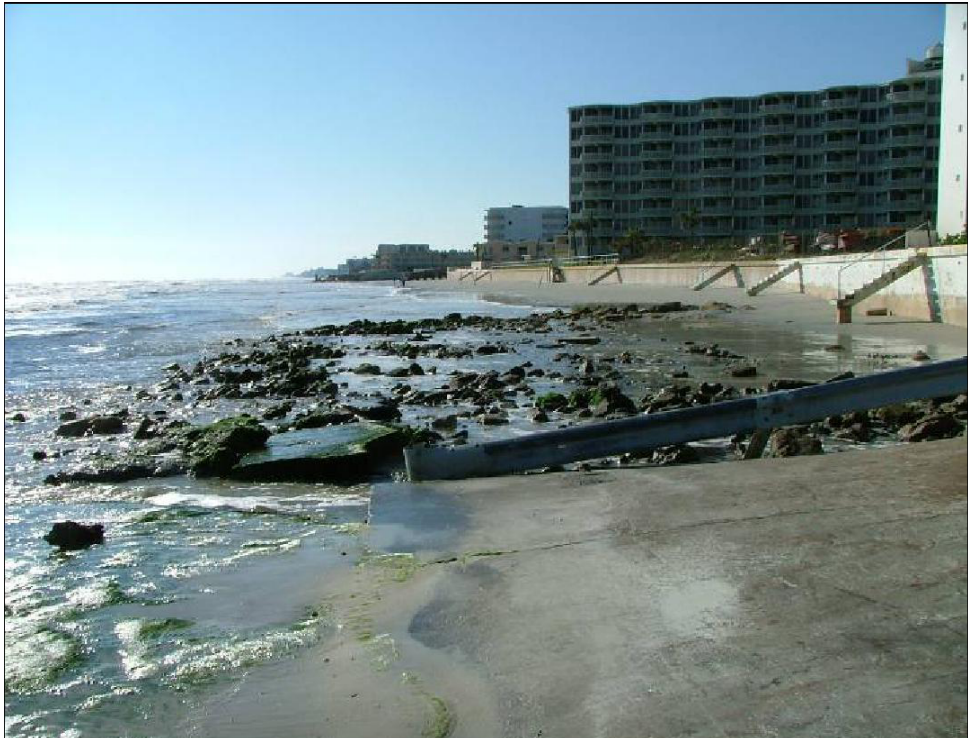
Major beach erosion, New Smyrna Beach (R162); concrete vehicular access ramp in foreground.
